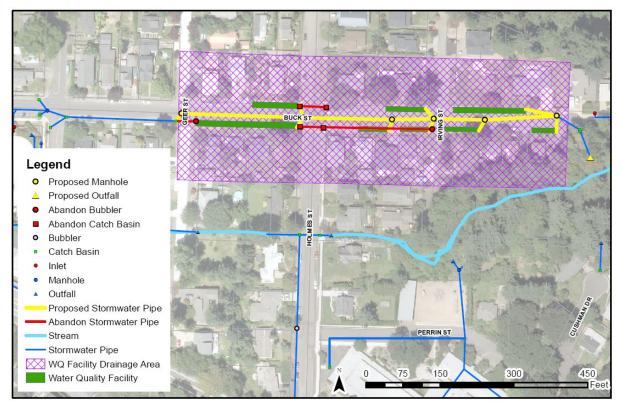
Project I-3. Buck Street Improvements (Proposed configuration)
